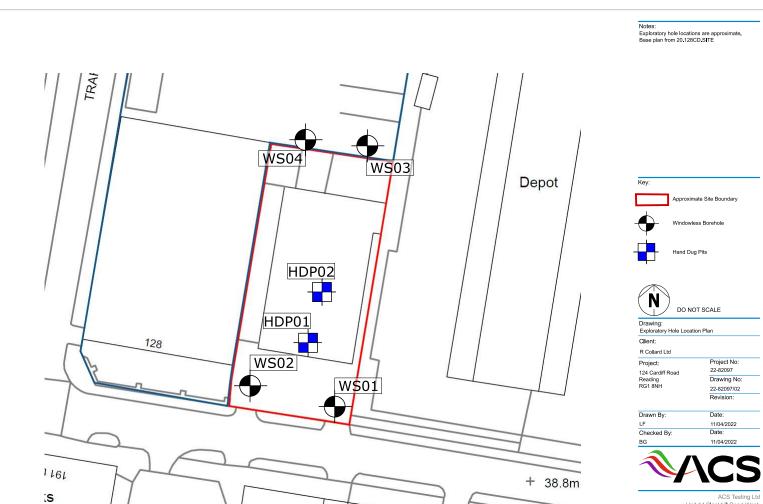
Exploratory Hole Location Plan – Existing Layout (Drawing No. 22-82097/02)
